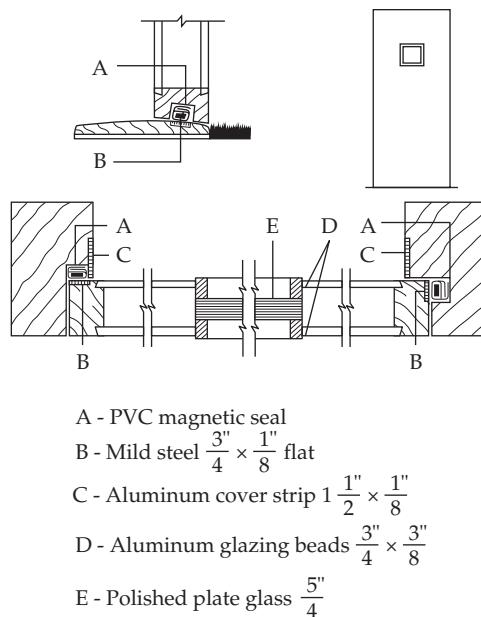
A door design utilizing magnetic seals of the type used on refrigerator doors.
